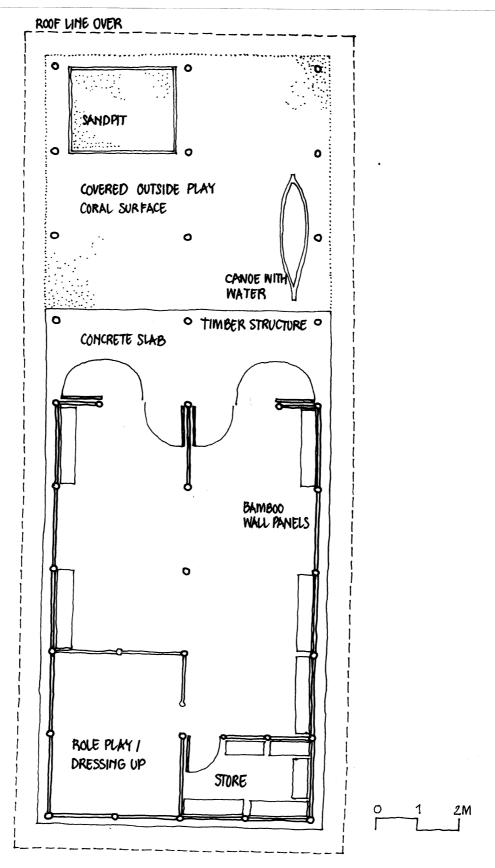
Proposed pre-school in Vanuatu for 30 children constructed by community labour of local timber with woven bamboo wall panels, a thatch roof and woven bamboo shutters. The building will require substantial bracing in order to stand up to cyclones.
